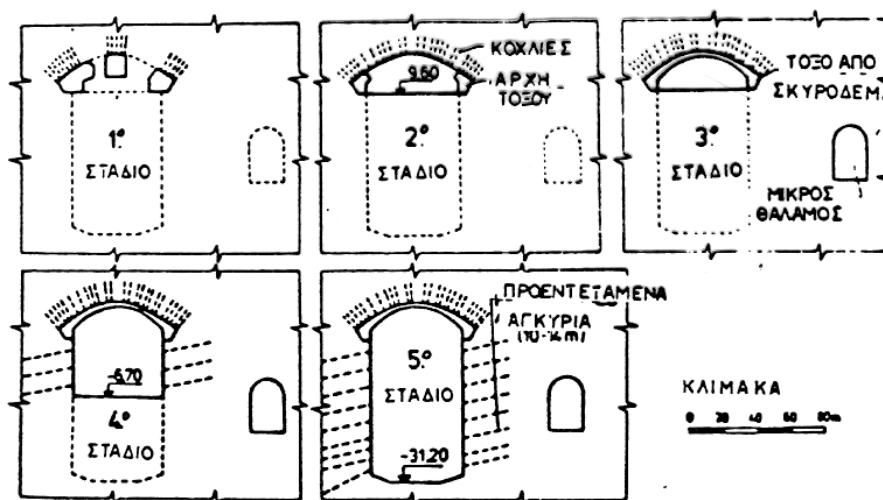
Stages of Excavation and Placement of the Support of the Excavation.
